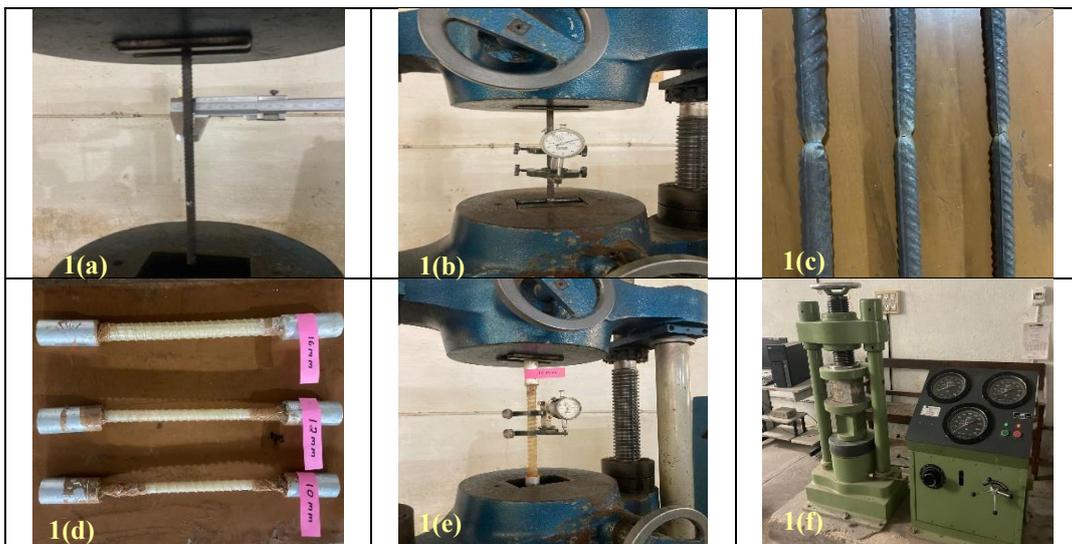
(a) Actual measurements of specimens checked, (b) Tensile test conducted on steel bars, (c) Tested steel specimens, (d) GFRP bars with aluminum casing are designed to ensure from crushing while gripping, (e) Tensile test conducted on GFRP bars, and (f) Design mix cube tested for compression.
